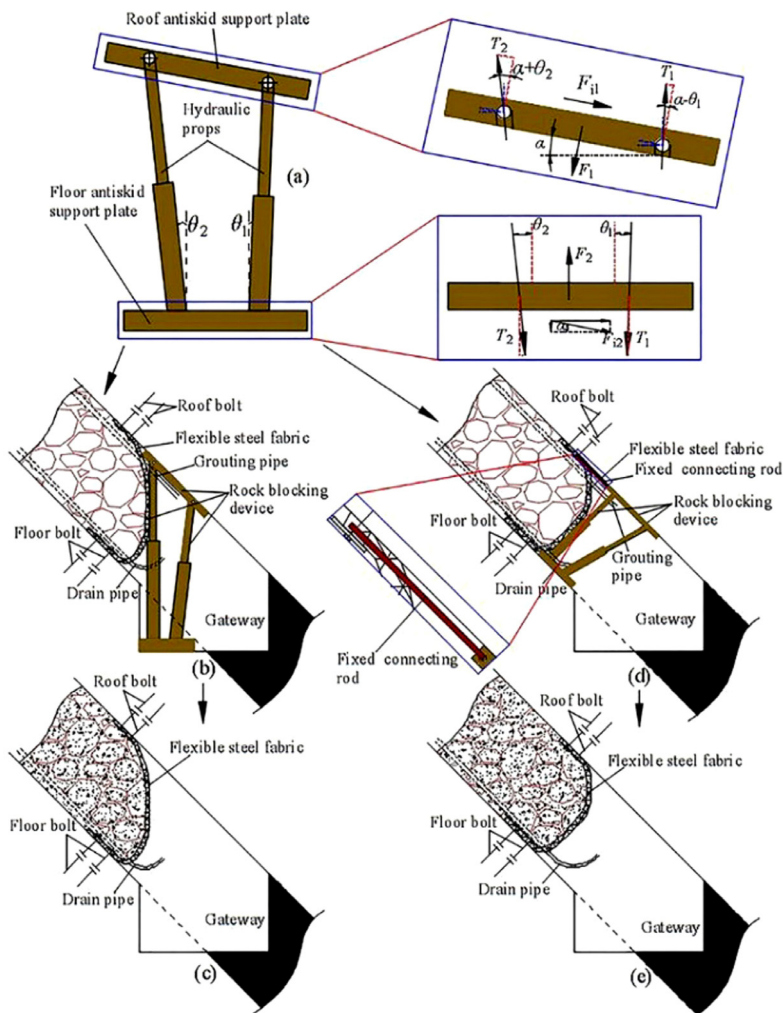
Rock blocking device and grouting reinforcement method. (a) Rock blocking device; (b) gateway blocking device; (c) grouting effect; (d) gob-side blocking device; and (e) grouting effect
